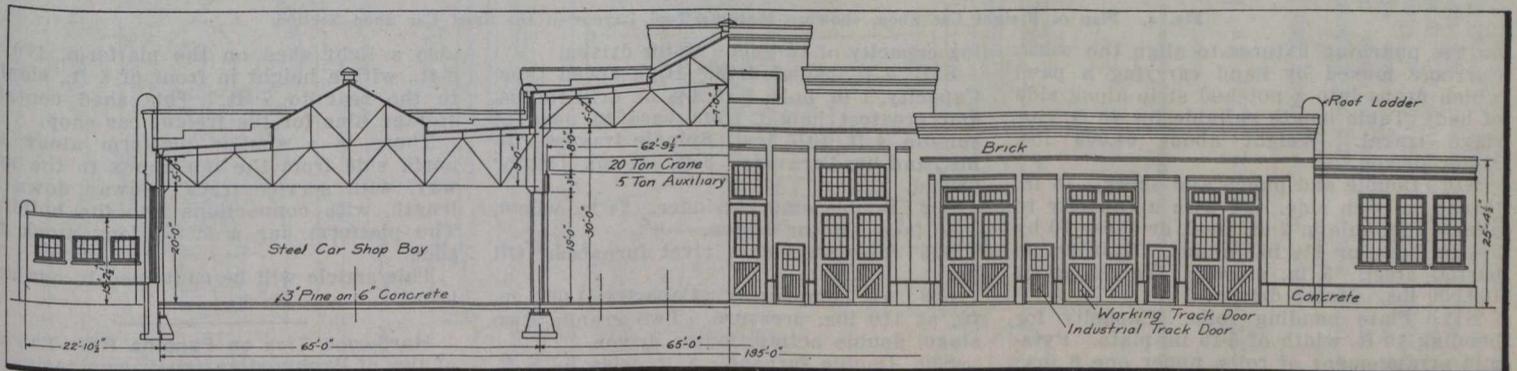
Cross Section and End Elevation of Freight Car Shop.
